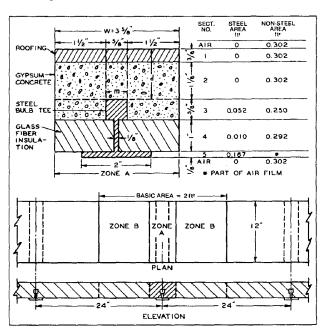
Gypsum Roof Deck on Bulb Tees (Example 4)
